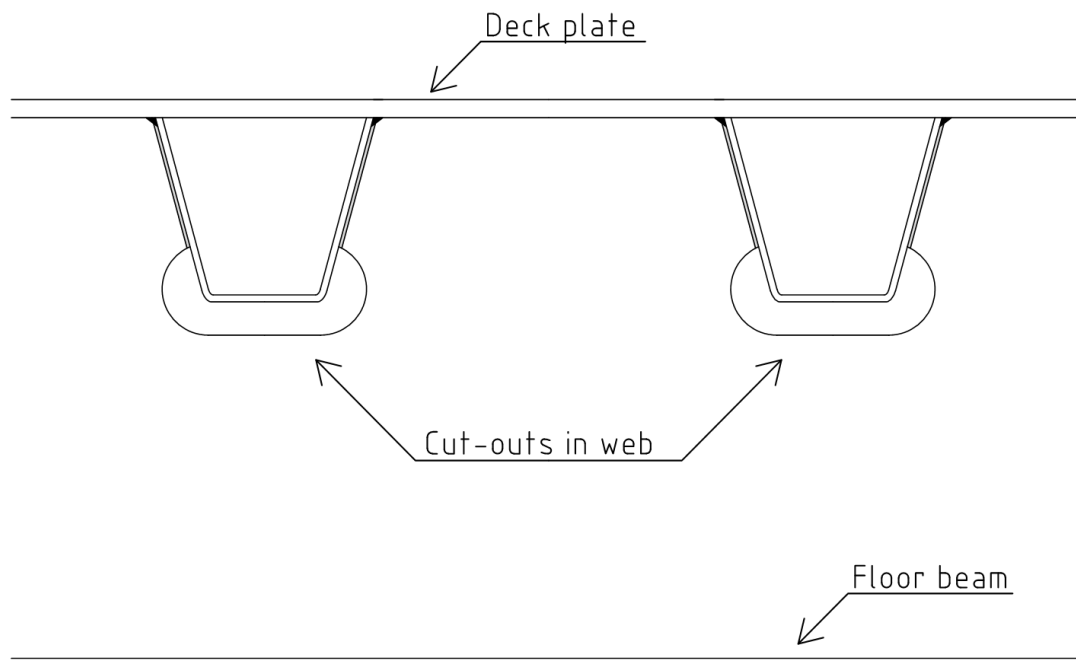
Cut-outs in transversal floor beams at the intersection with longitudinal ribs
